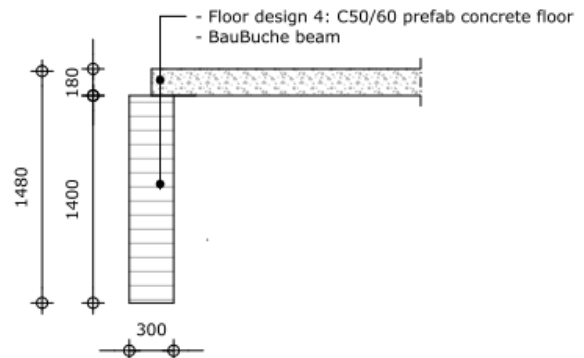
Floor design 4 BauBuche beam detail cross-section D-D in mm
